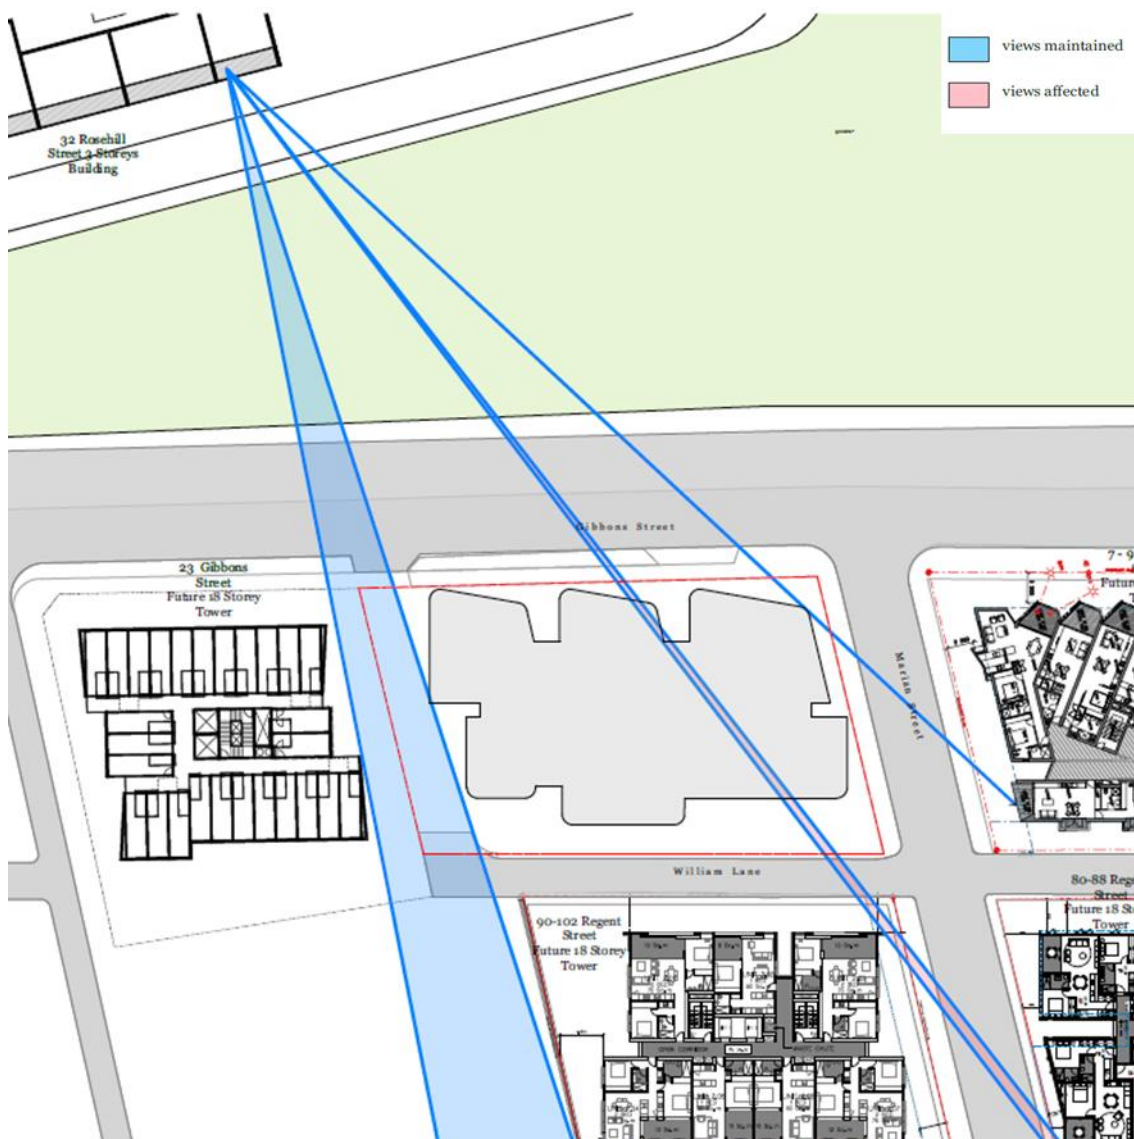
Views likely to be affected and maintained for 18-32 Rosehill Street (source: DKO)
